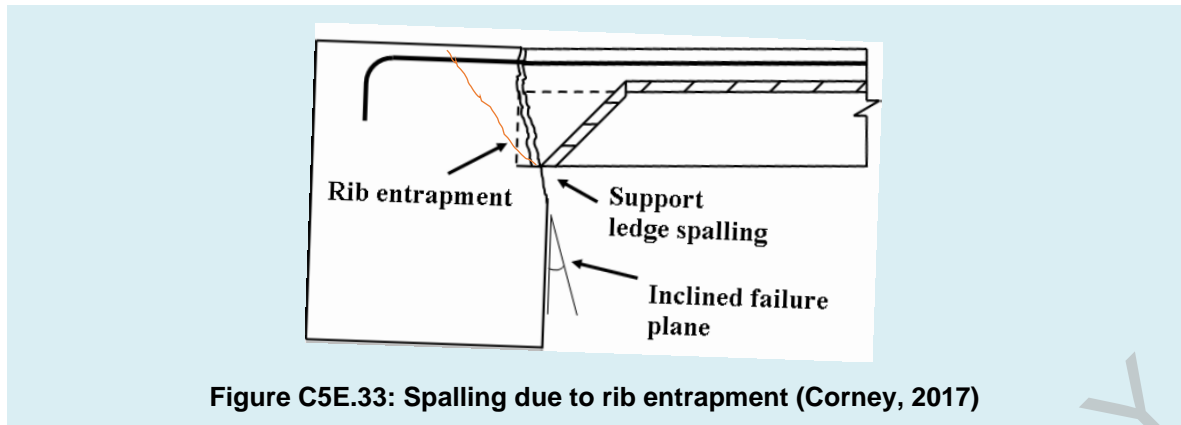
E.33: Spalling due to rib entrapment (Corney, 2017)
